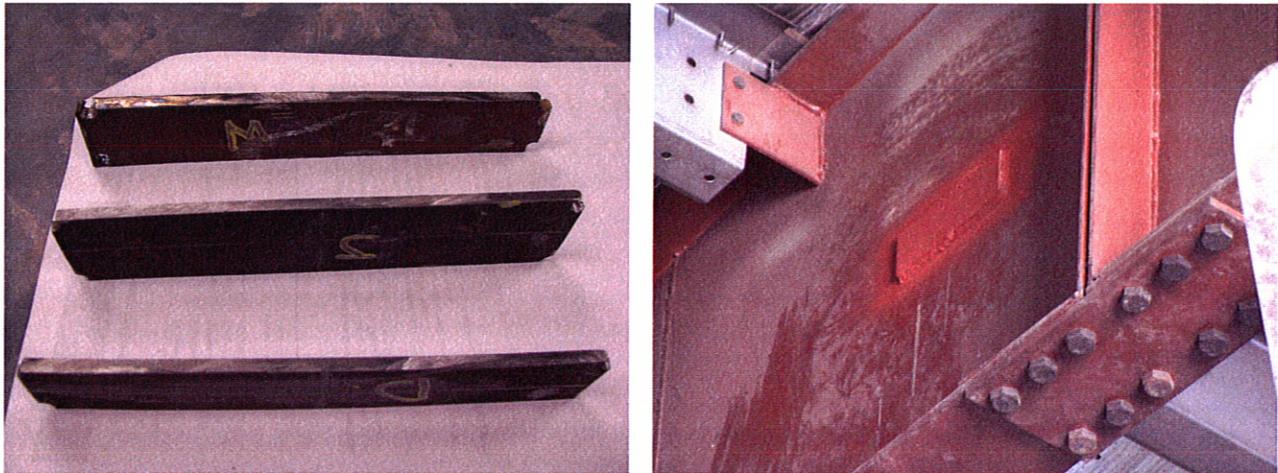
Samples cut from existing roof beams. Figure 2. Roof beam after repair work.
